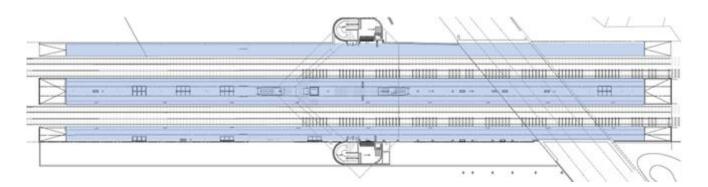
Typical platform arrangement. Park West & Cherry Orchard Station
